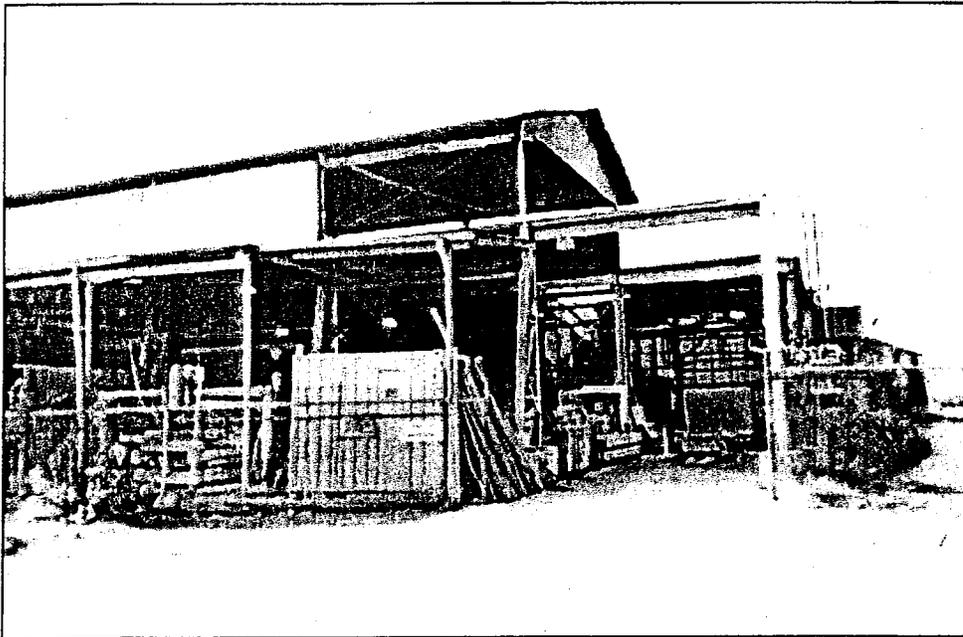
No sidewalks, curbs or gutters at 1651 Miller Ave.
